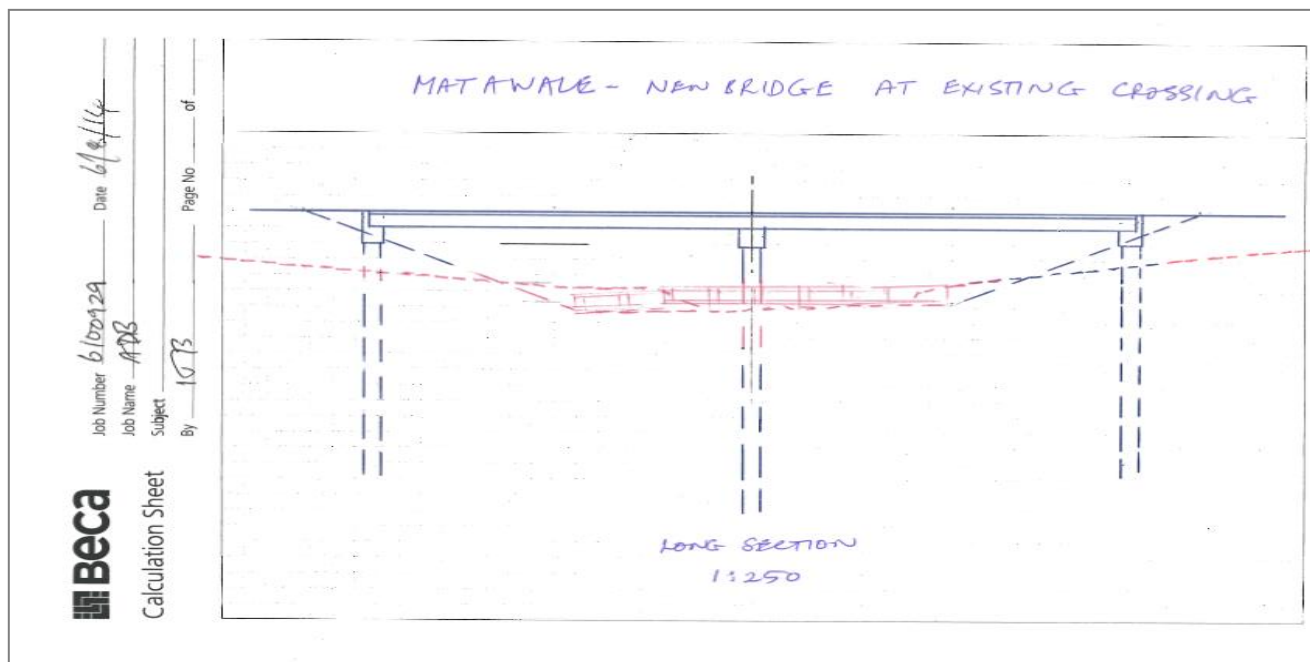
Cross section of new Matawale bridge - possible alternative: Option (b)
